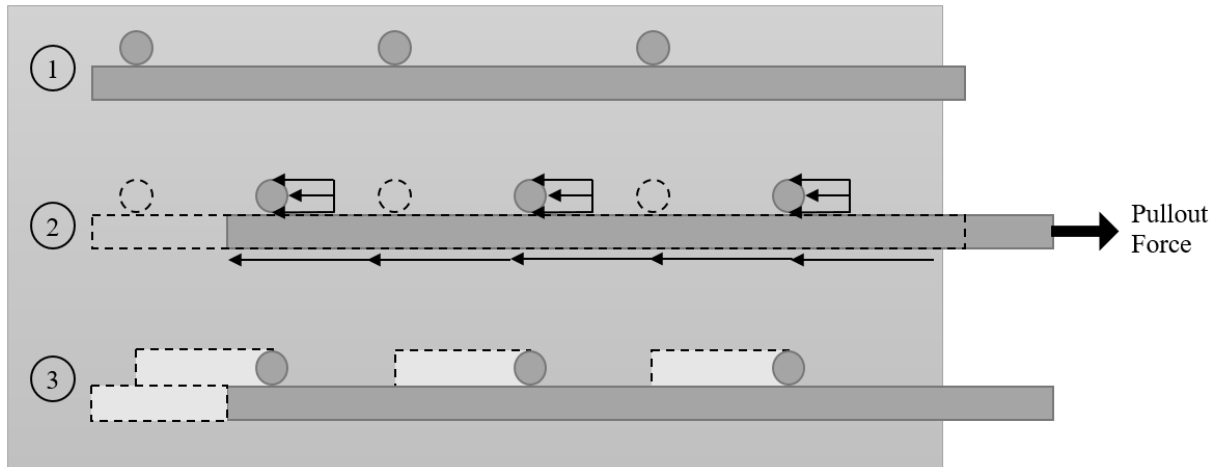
Drawing showing the failure mechanism of welded-wire reinforcement.
